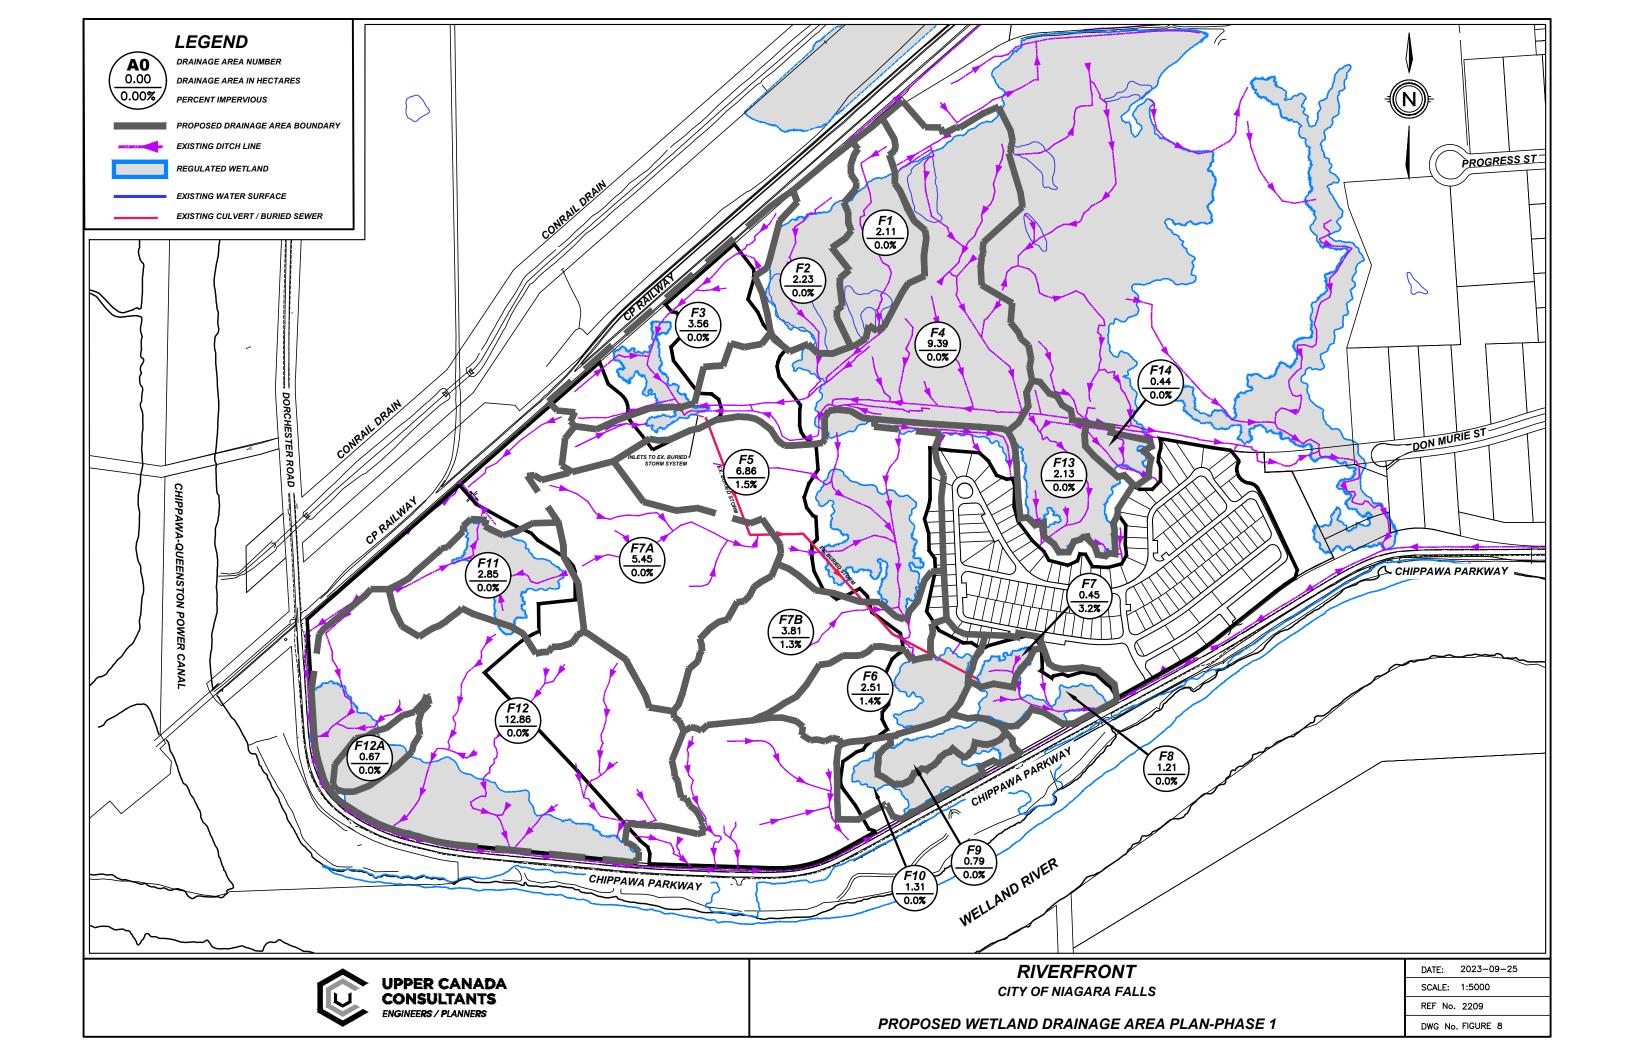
Schematic of Proposed Wetland Drainage Area Plan (Phase 1)
